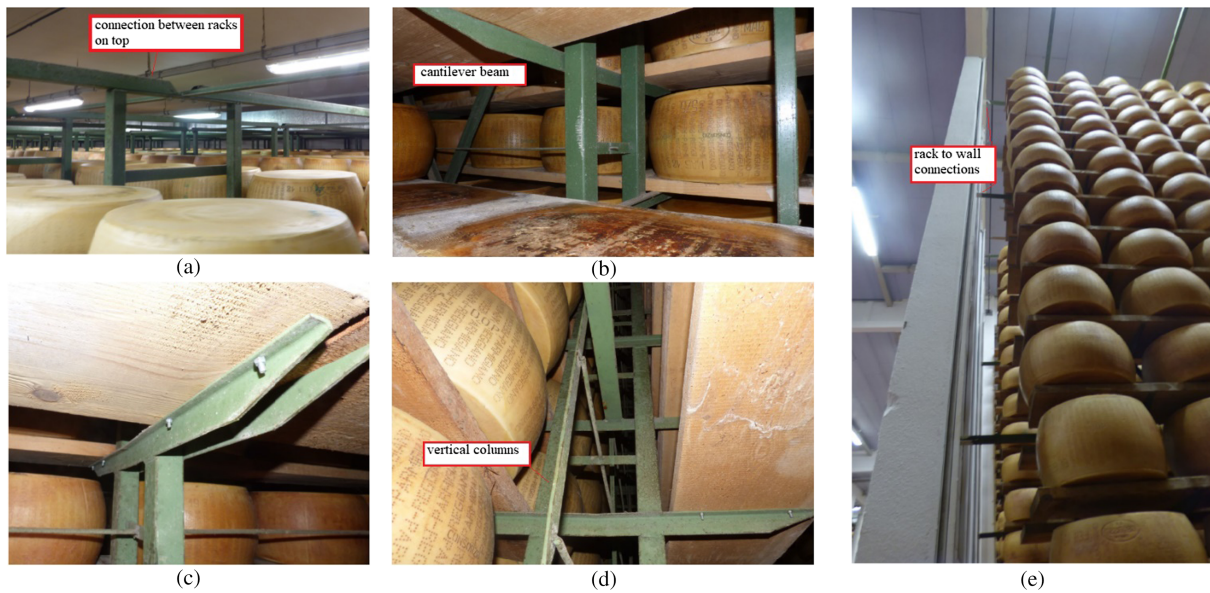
Typical components and dimensions in storage racks for cheese wheels
